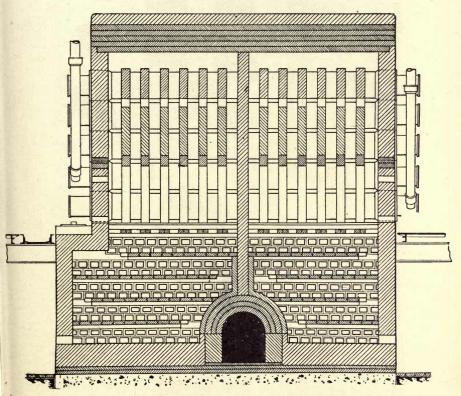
SECTIONAL ELEVATION OF RETORT SETTING, SHOWING FLUES AND PASSAGES
